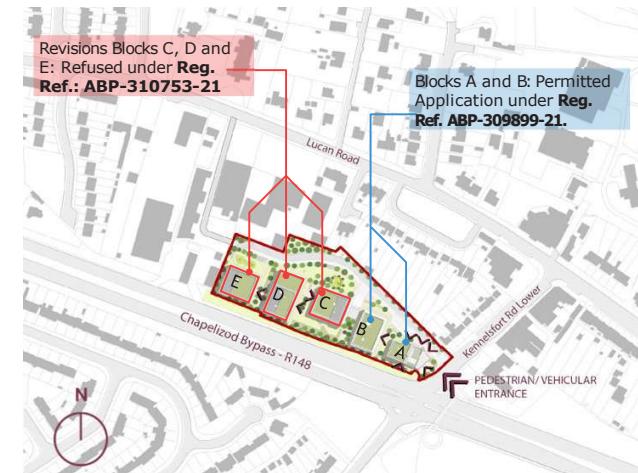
Refused Site Layout - Reg. Ref. ABP-310753-21
